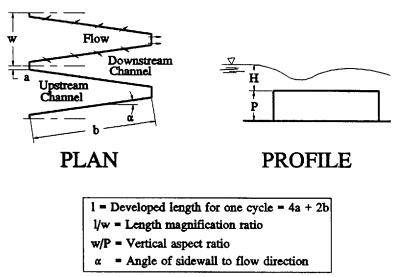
Plan and profile of a trapezoidal labyrinth weir.
